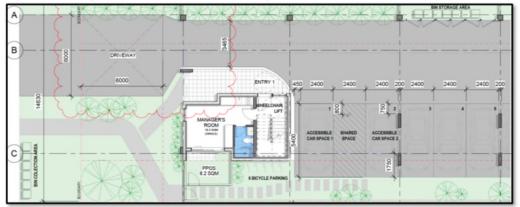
Ground Floor Plan - Part 1 (Source: Extracted from Revised Architecture Plans)
